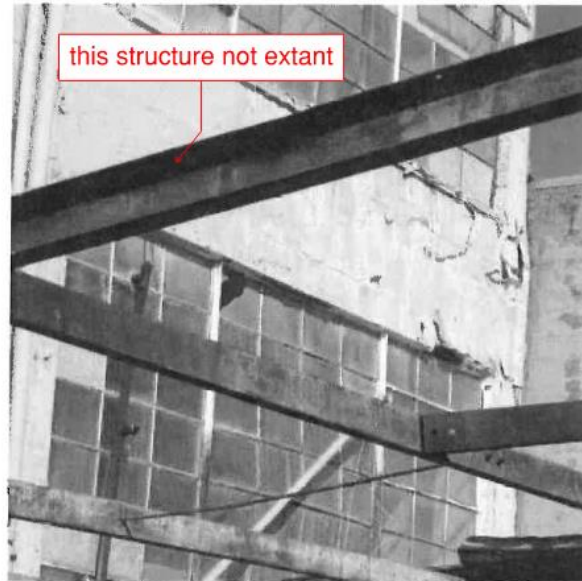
The first and second floor windows in the easternmost bay. Knapp Architects photo, 2019.
